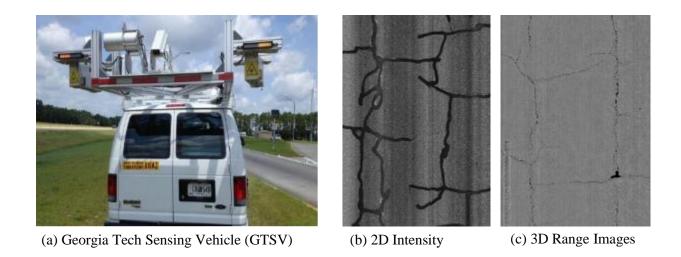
Photo. GTSV and Example of 2D, 3D Pavement Surface Images
